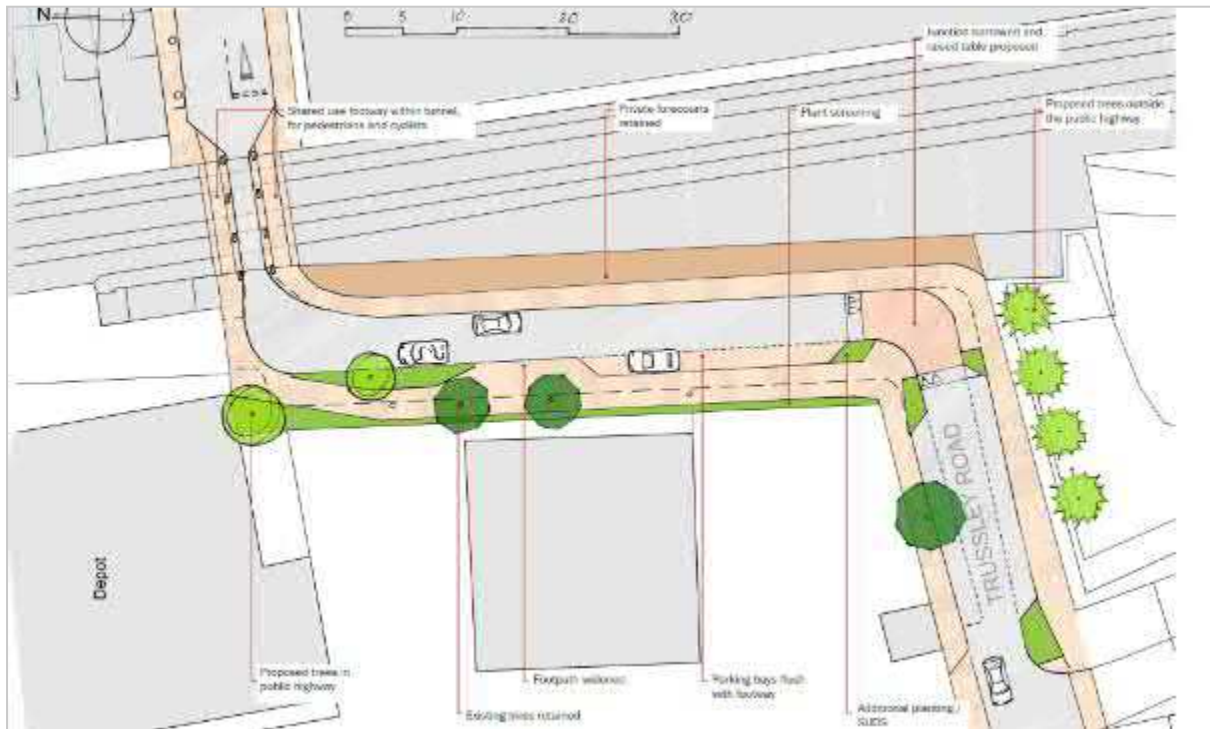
Sketch of Improvement Opportunities at Trussley Road
